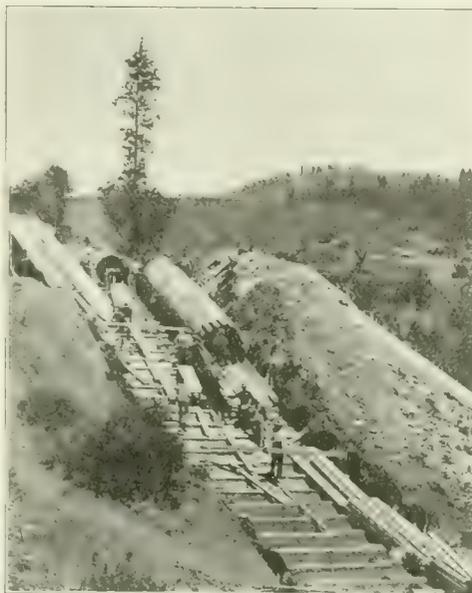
View of Double Line of 66 in. Continuous Stave Wooden Pipe Under Construction for Sierra and San Francisco Power Co.
